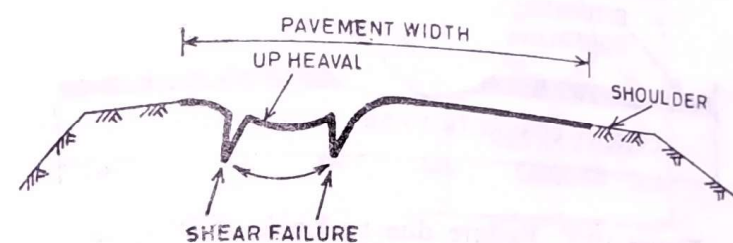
A typical Road Section showing Shear Failure Cracking
